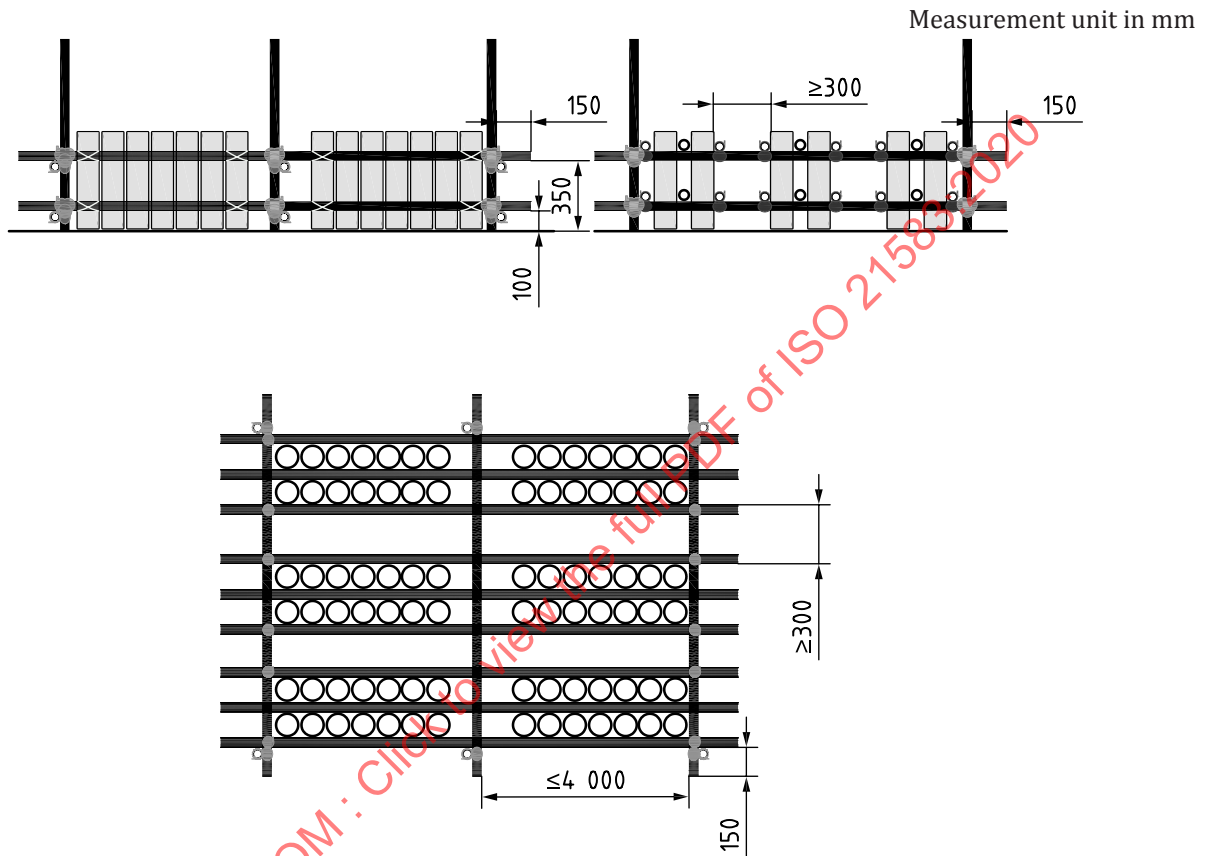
Example of installation of mortars of shells ($\Phi = 76 \text{ mm}, 103 \text{ mm}$) with steel tube racks
